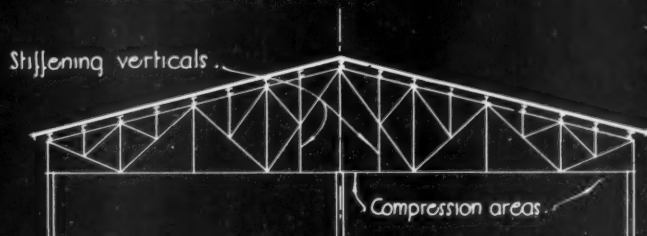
secondary stiffening verticals for continuous or cantilevered trusses
